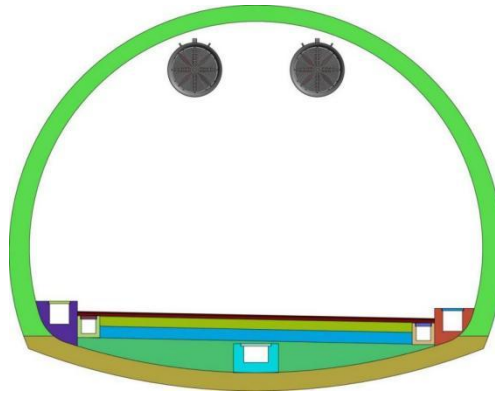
Elevation View of the BIM Model Layout for Ventilation Facilities
